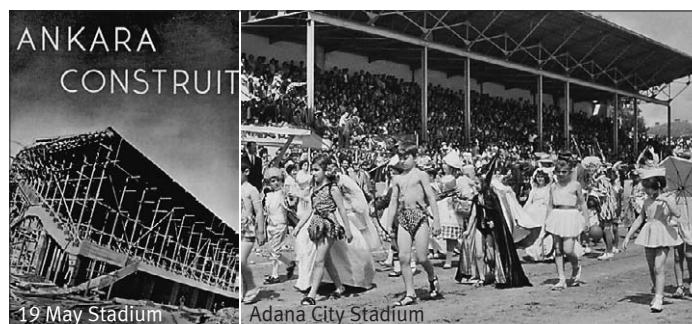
USING REINFORCED CONCRETE AND STEEL FOR THE CONSTRUCTION OF THE STADIUMS. CONSTRUCTION FACE OF THE 19 MAY STADIUM IN ANKARA
